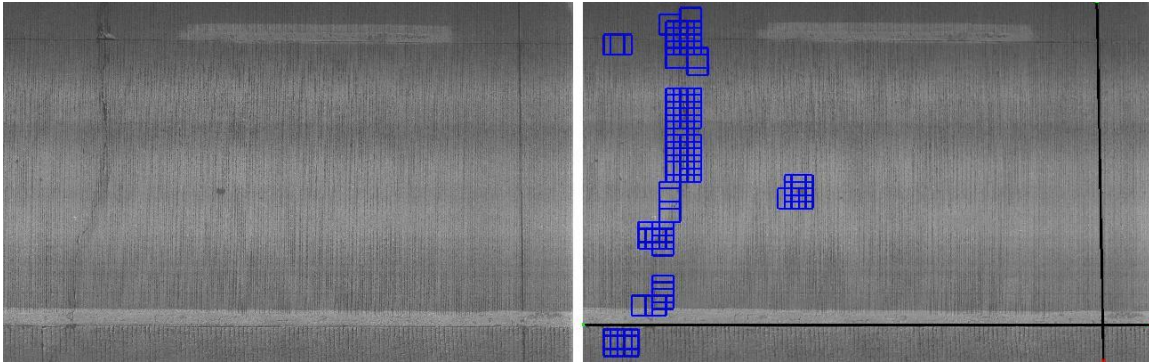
Example 1 of concrete crack at high severity: raw crack (left) and crack detection (right)
